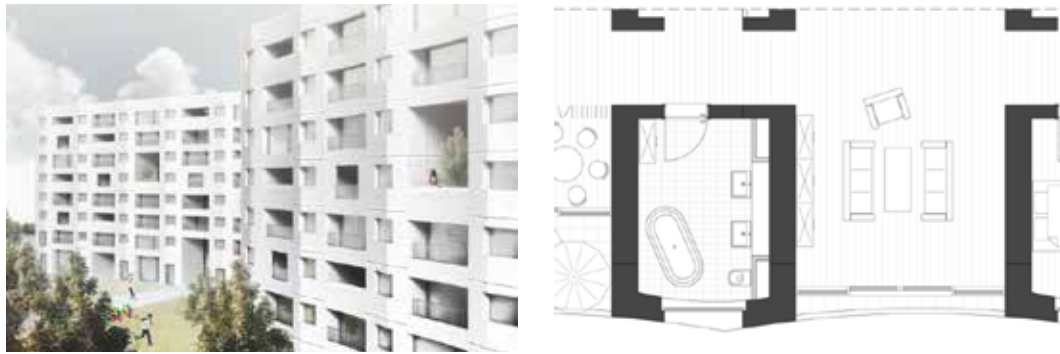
Zeilenbau (linear block) Alte Jakobstraße (Leibinger et al. 2016)
